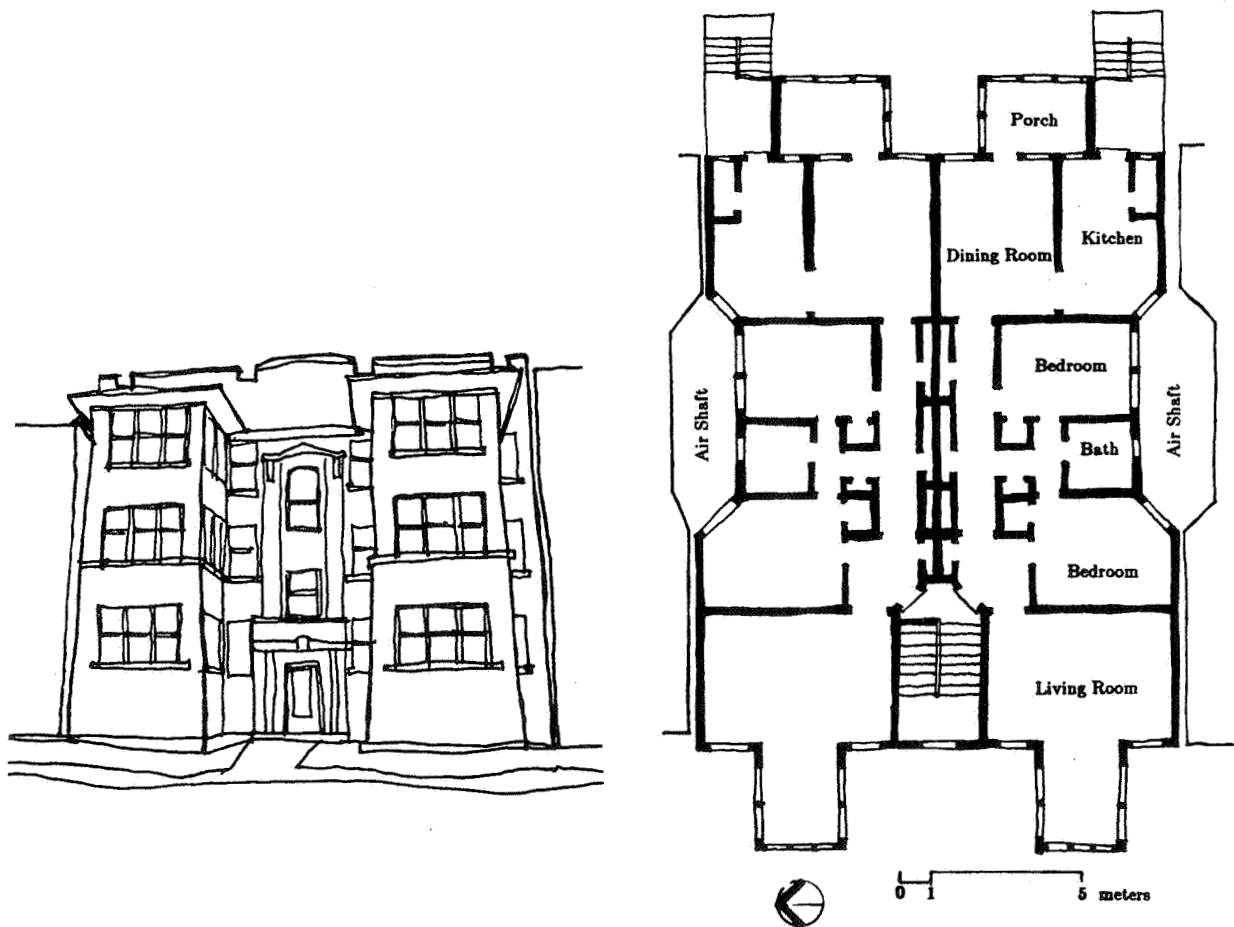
Plan and elevation for Bosworth, (Chicago c. 1920).
